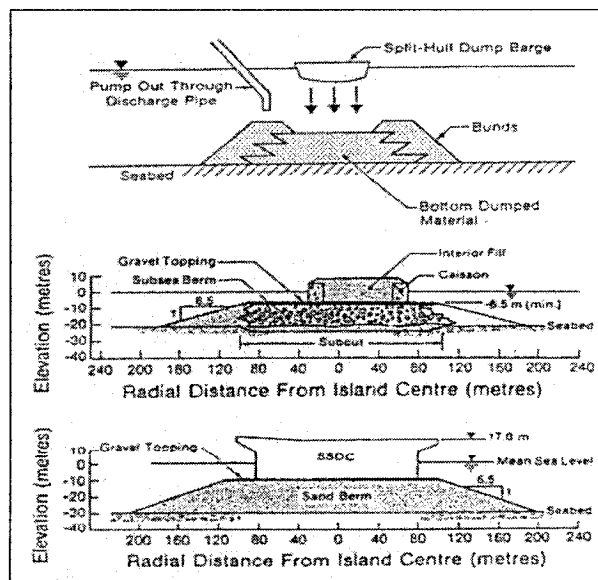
A typical artificial island structure (Mitchell (1988))
